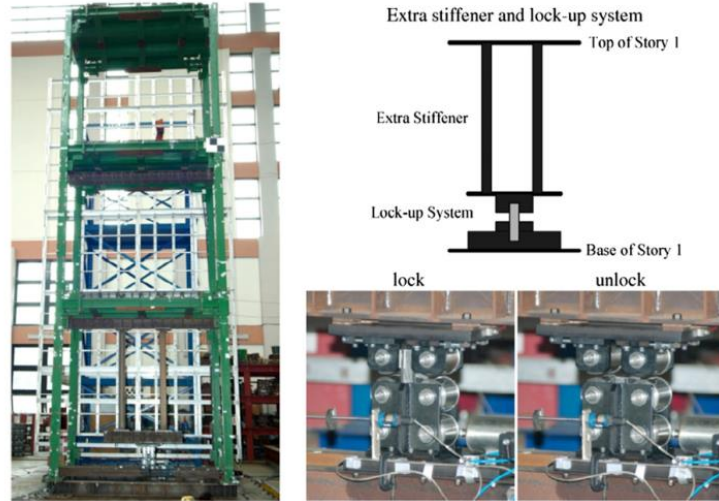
A 3-story steel frame with a lock-up system on the 1st floor (referred to [36])
